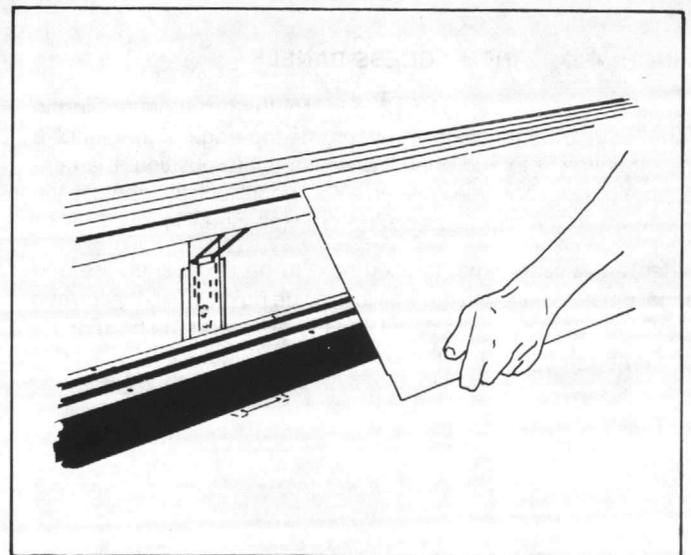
Attaching Type TA Front Panel to the Grille
